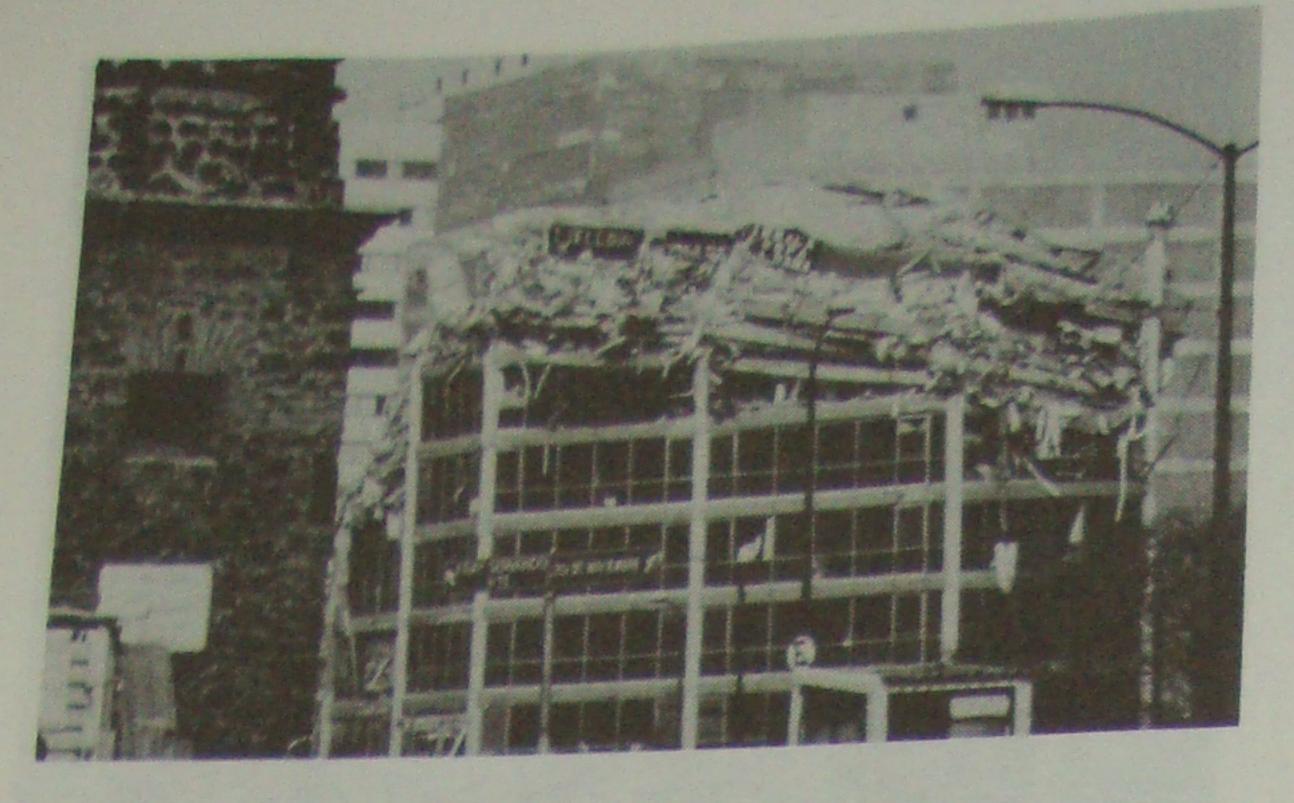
Failure of upper storeys (Mitchell et al. 1986a&b).
